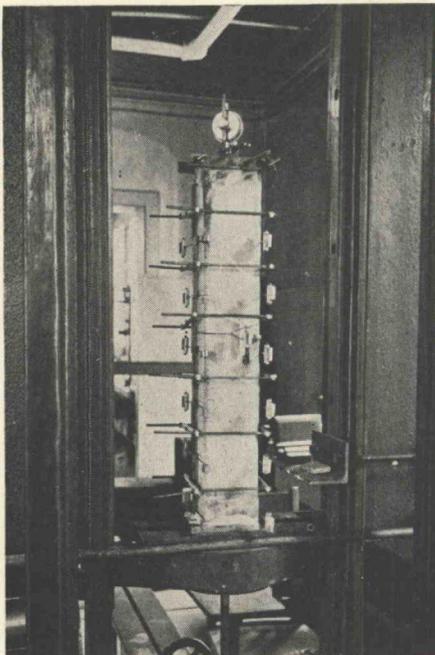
A 24-inch Pull-Out Specimen Ready for Test
